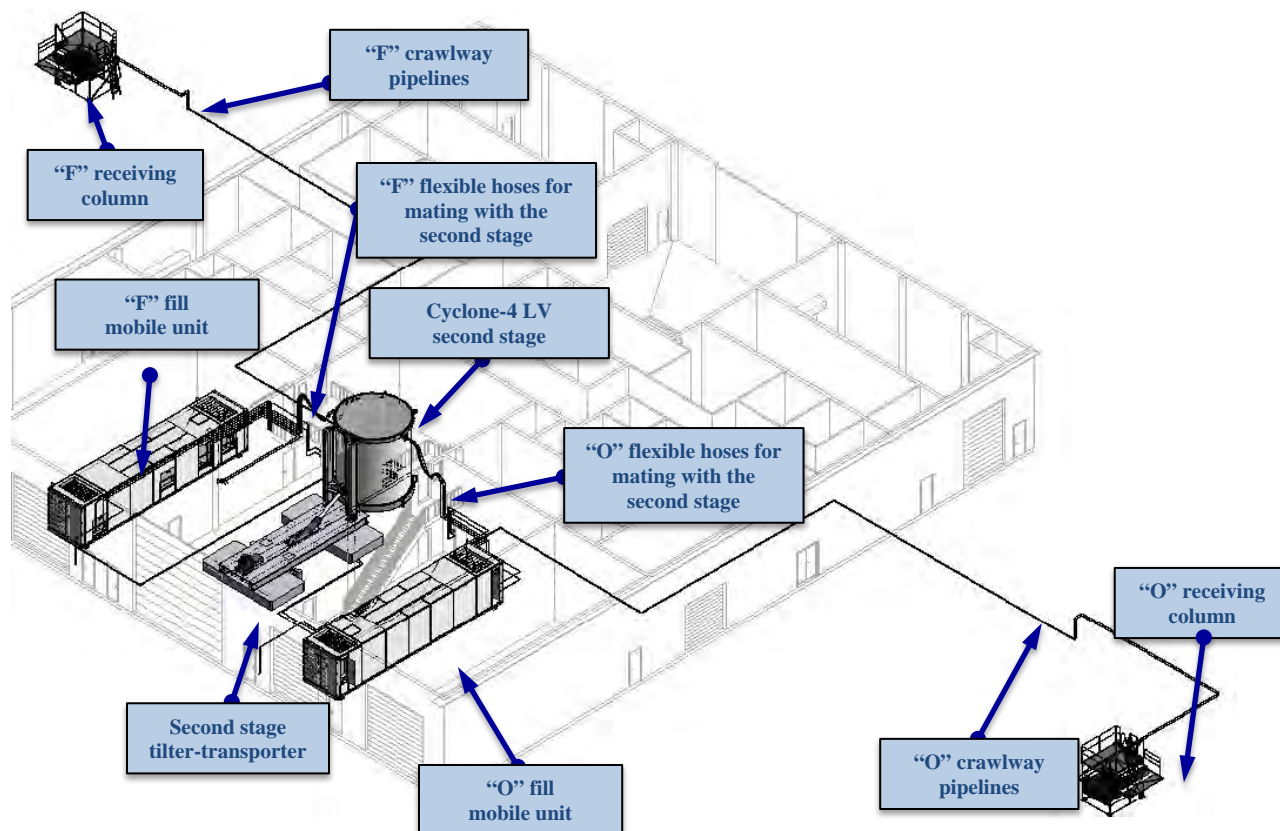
Layout of Second Stage Filling System Equipment at Fueling/Neutralization Station
